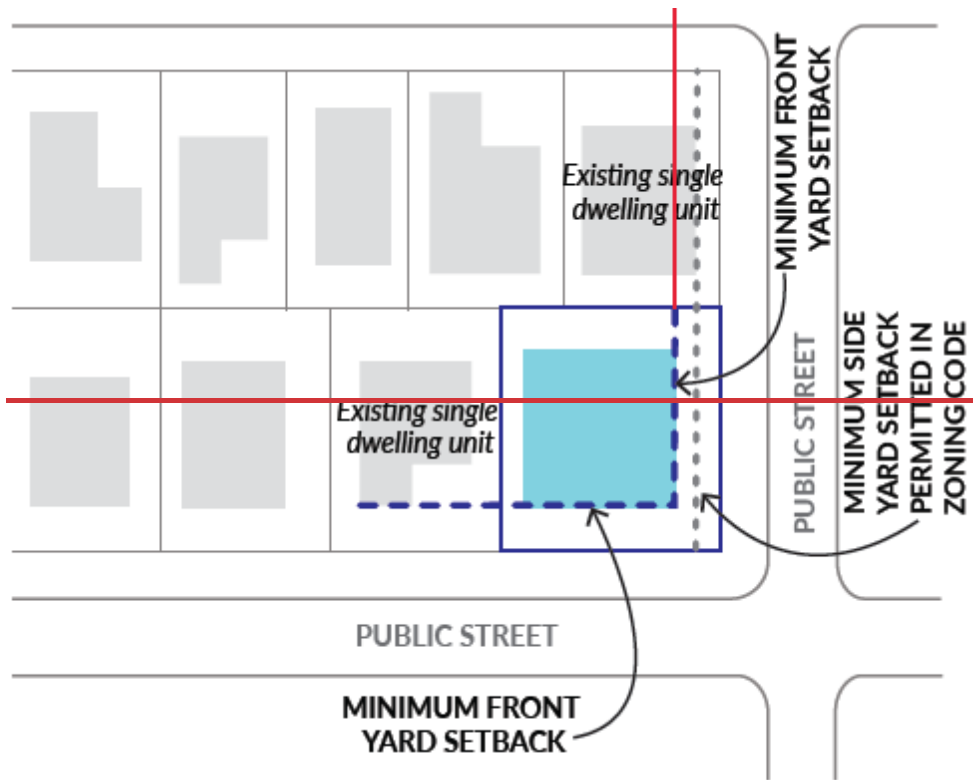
Front yard setbacks adjacent to single dwelling units on a corner lot.
